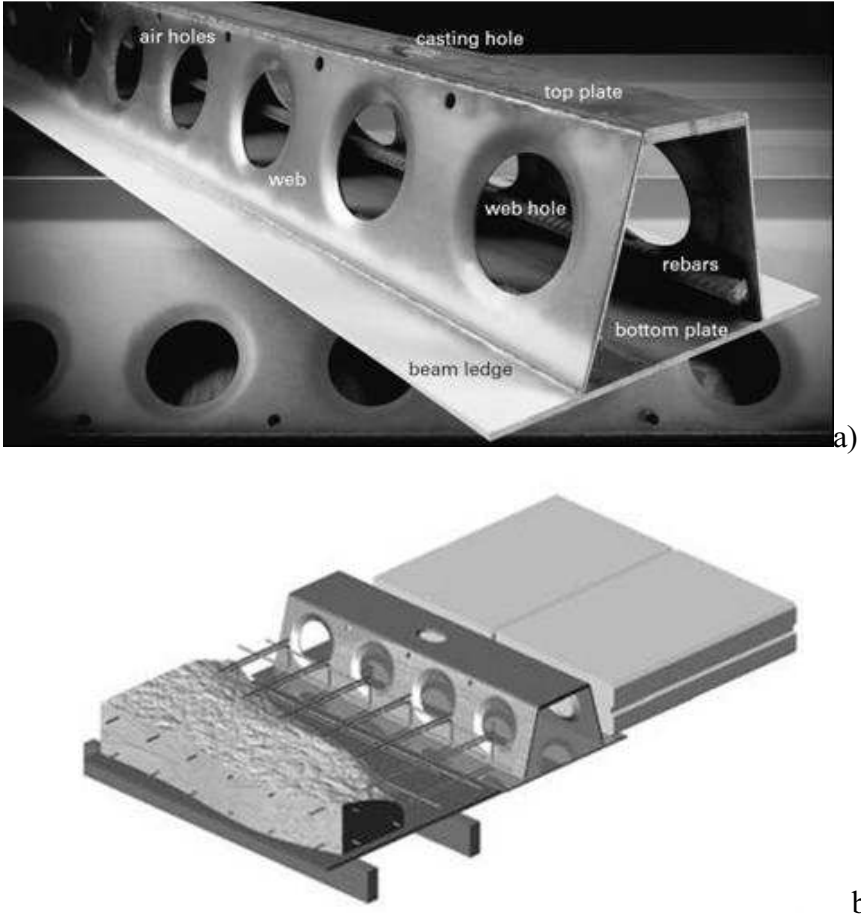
a) Typical DELTA beam; b) Delta beam with light weight pre-cast concrete element and in-situ casting [1].
